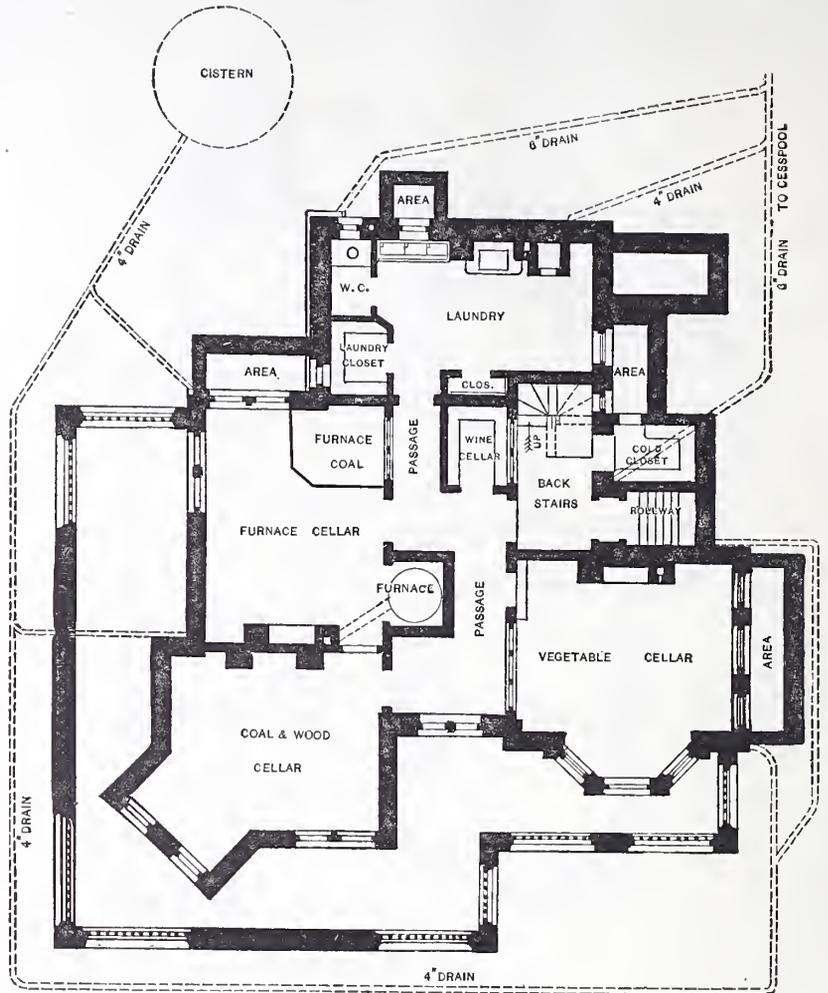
Foundation Plan by "T-Square," (No. 101).—Scale, 1-16 Inch to the Foot.
